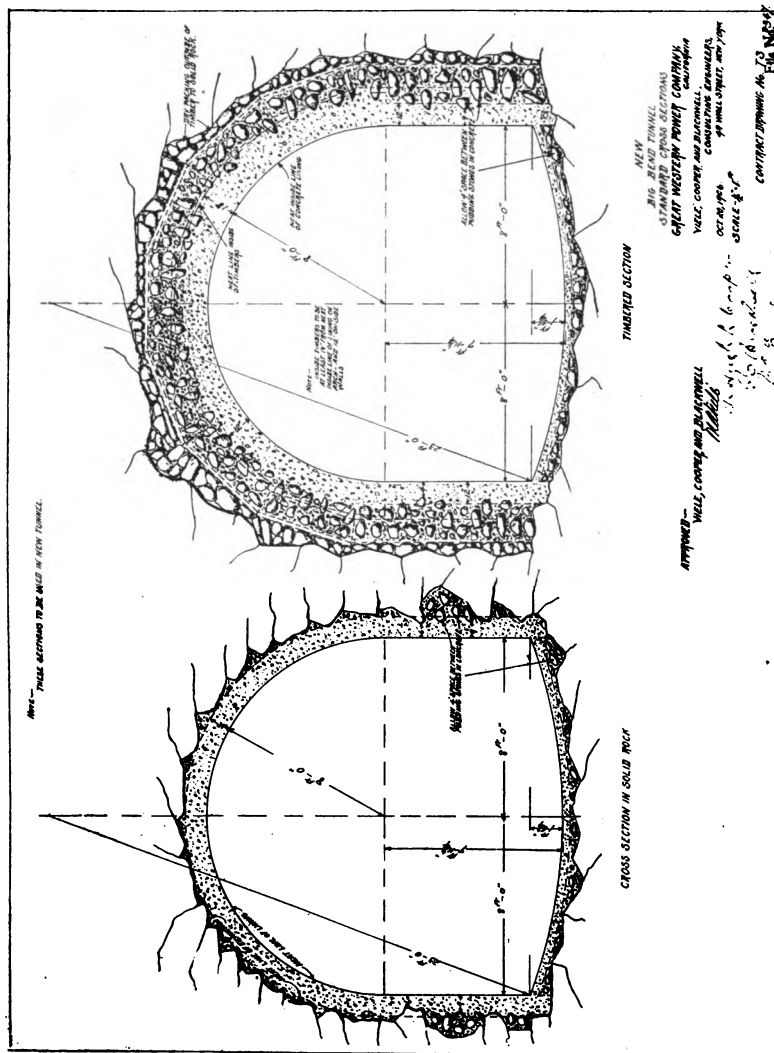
CROSS SECTIONS OF NEW TUNNEL.
